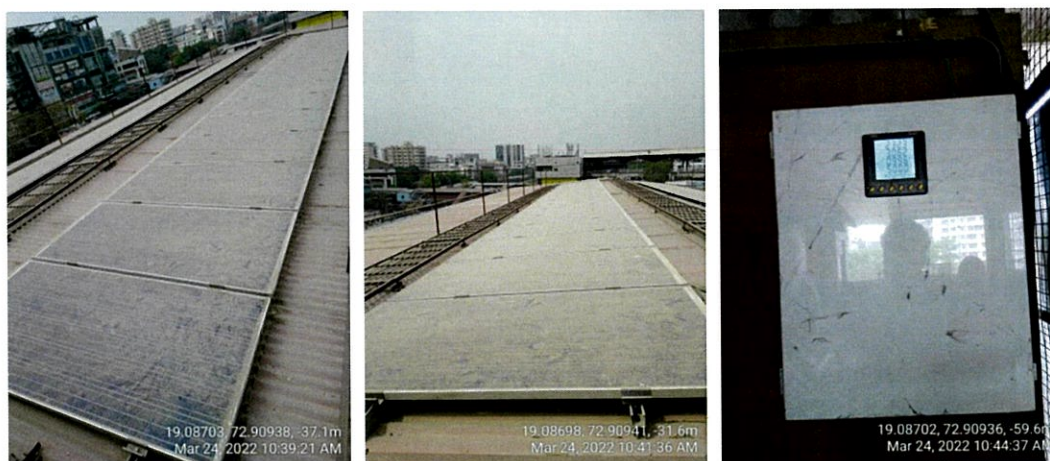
Installed Solar PV panels on the sloping roof and Solar meter of the college
